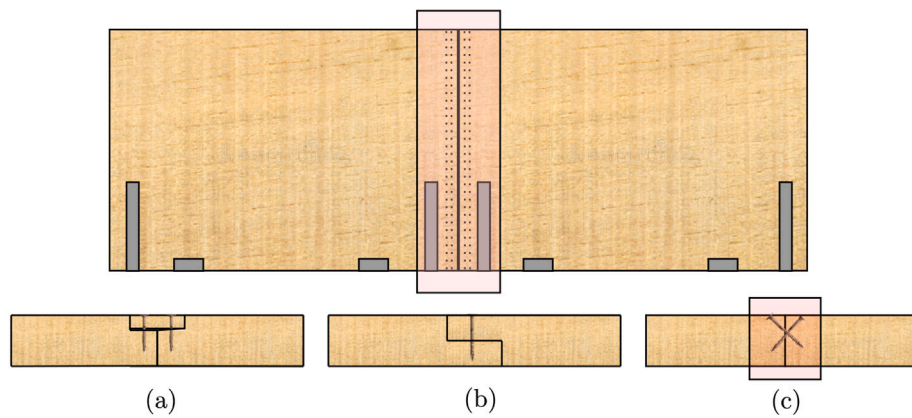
Possible ways to connect two adjacent parallel panels in a segmented CLT shear wall.
